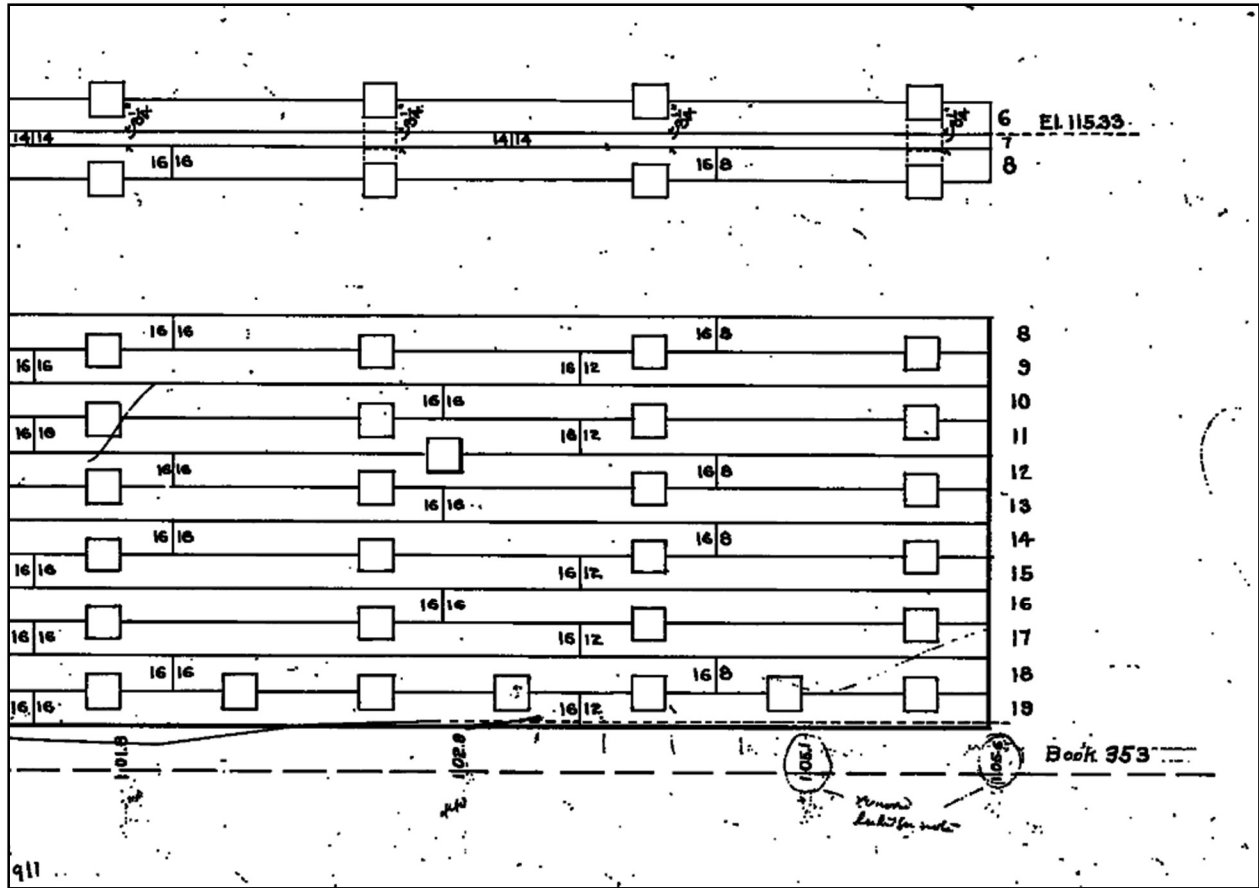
1906 WCP Crib Drawings – Crib 6 Detail (2020 Strike Location)
